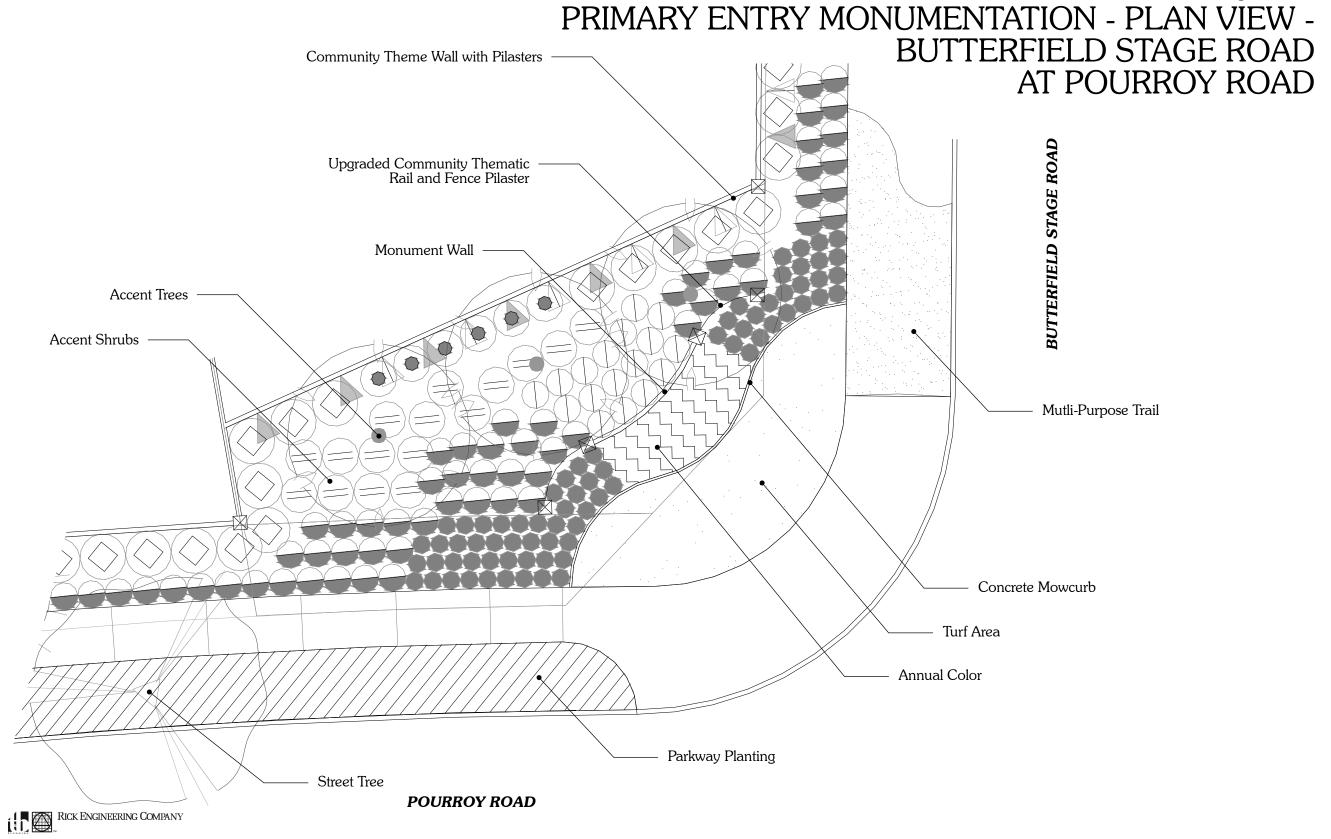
CONCEPTUAL LANDSCAPE PLAN
